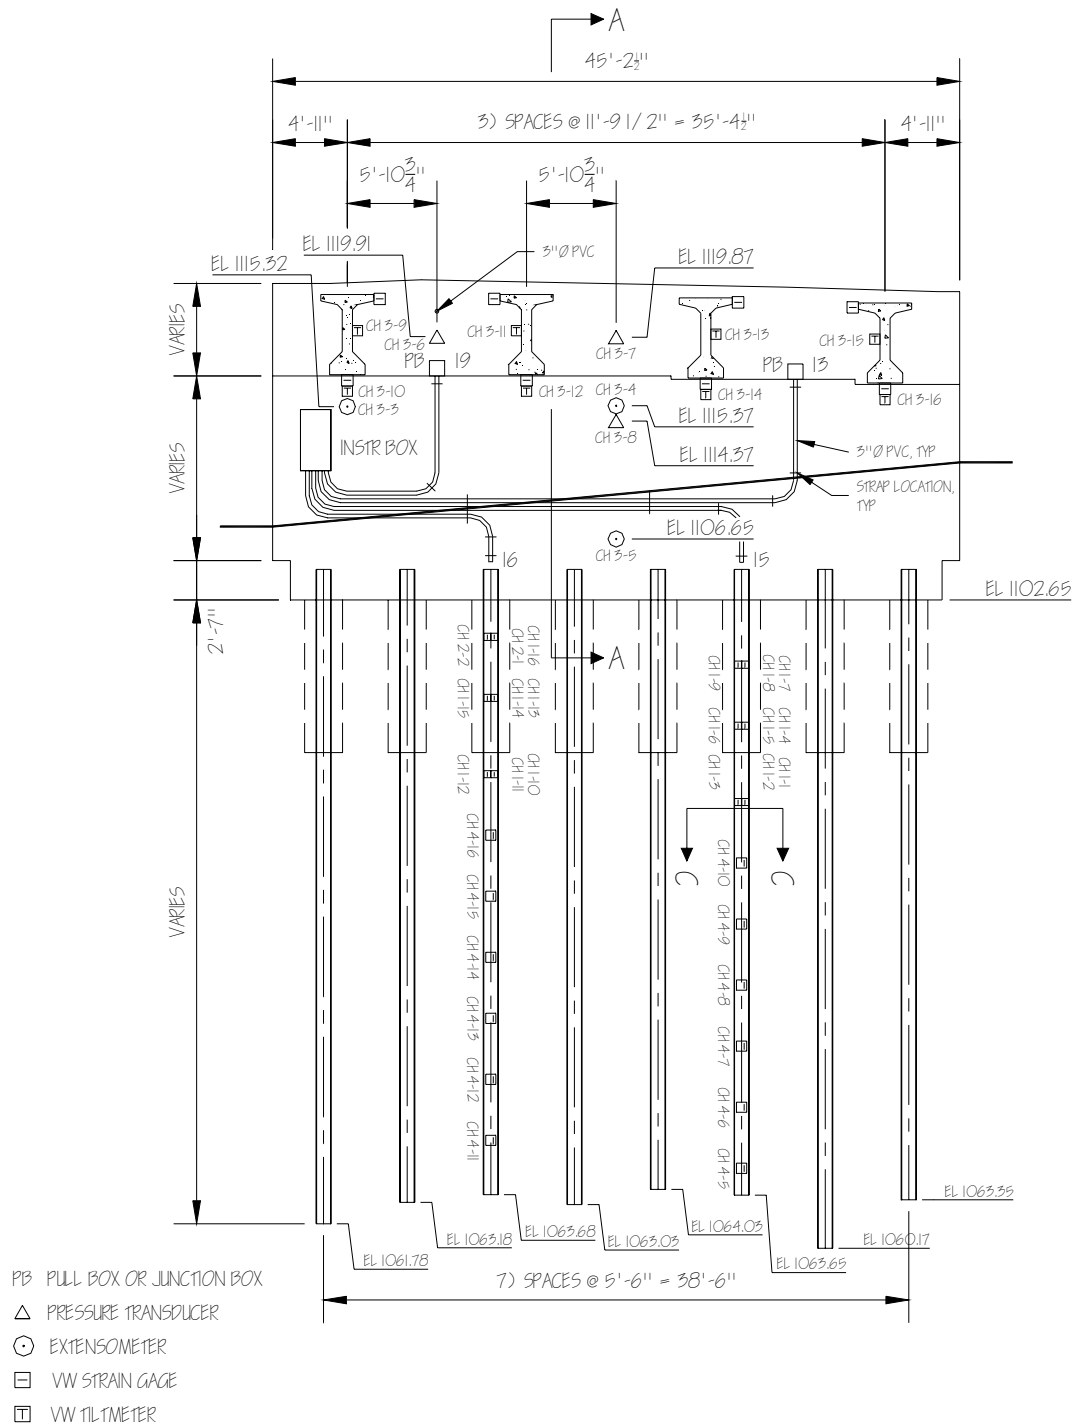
Structure 203 Abutment 2 Elevation (Section B-B)
